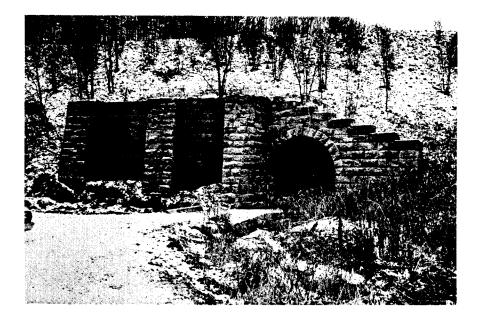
This asymetrical, massively buttressed railroad underpass was built at Honaker by the N & W Railroad between 1887 and 1889 on its Clinch River Extension, which tapped rich coal fields.
